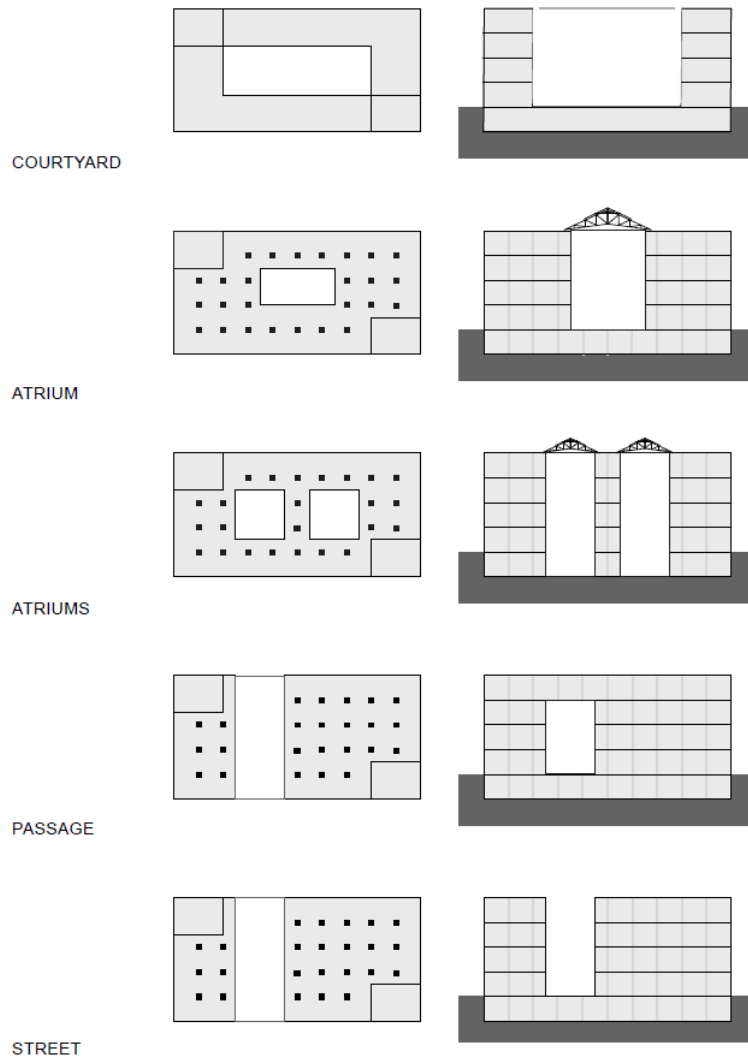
Spatial typology for the existing buildings from the Department Stores | V&D's.
